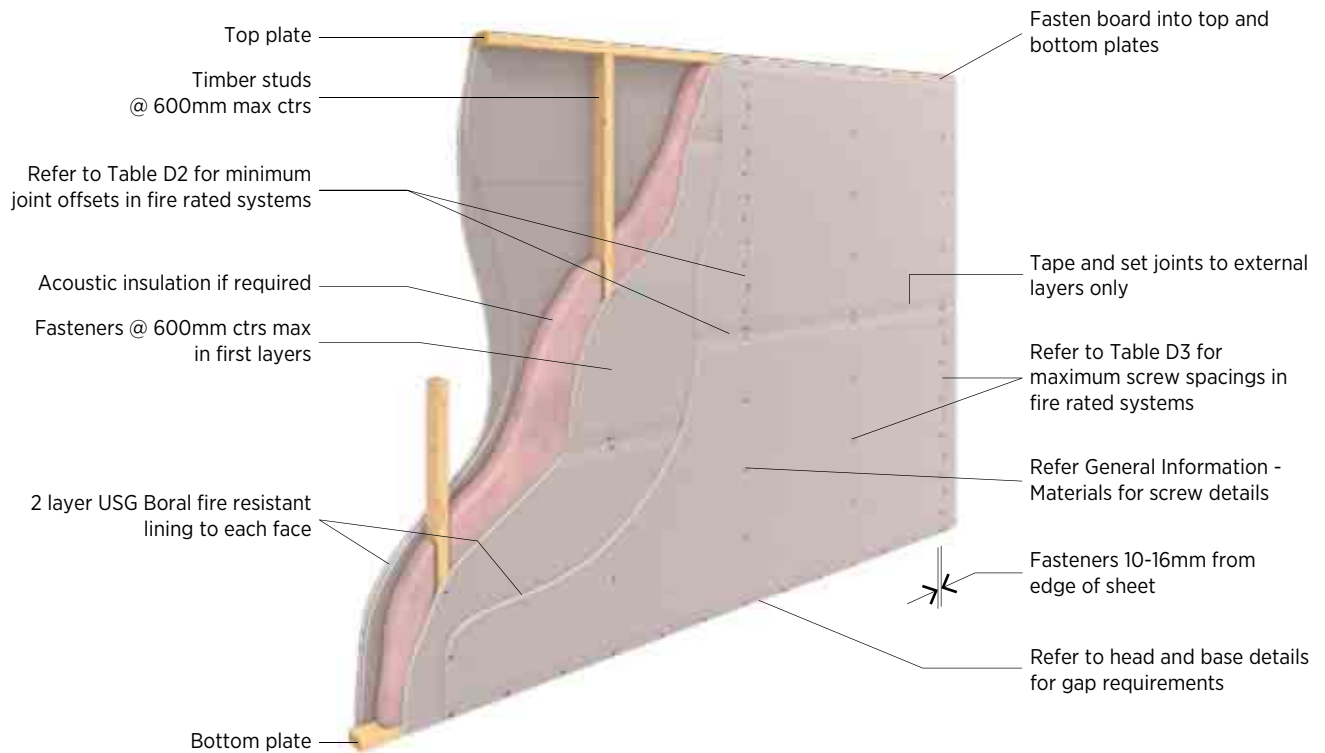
Fire Rated Timber Stud - Horizontal Fixing - Multiple Layer
